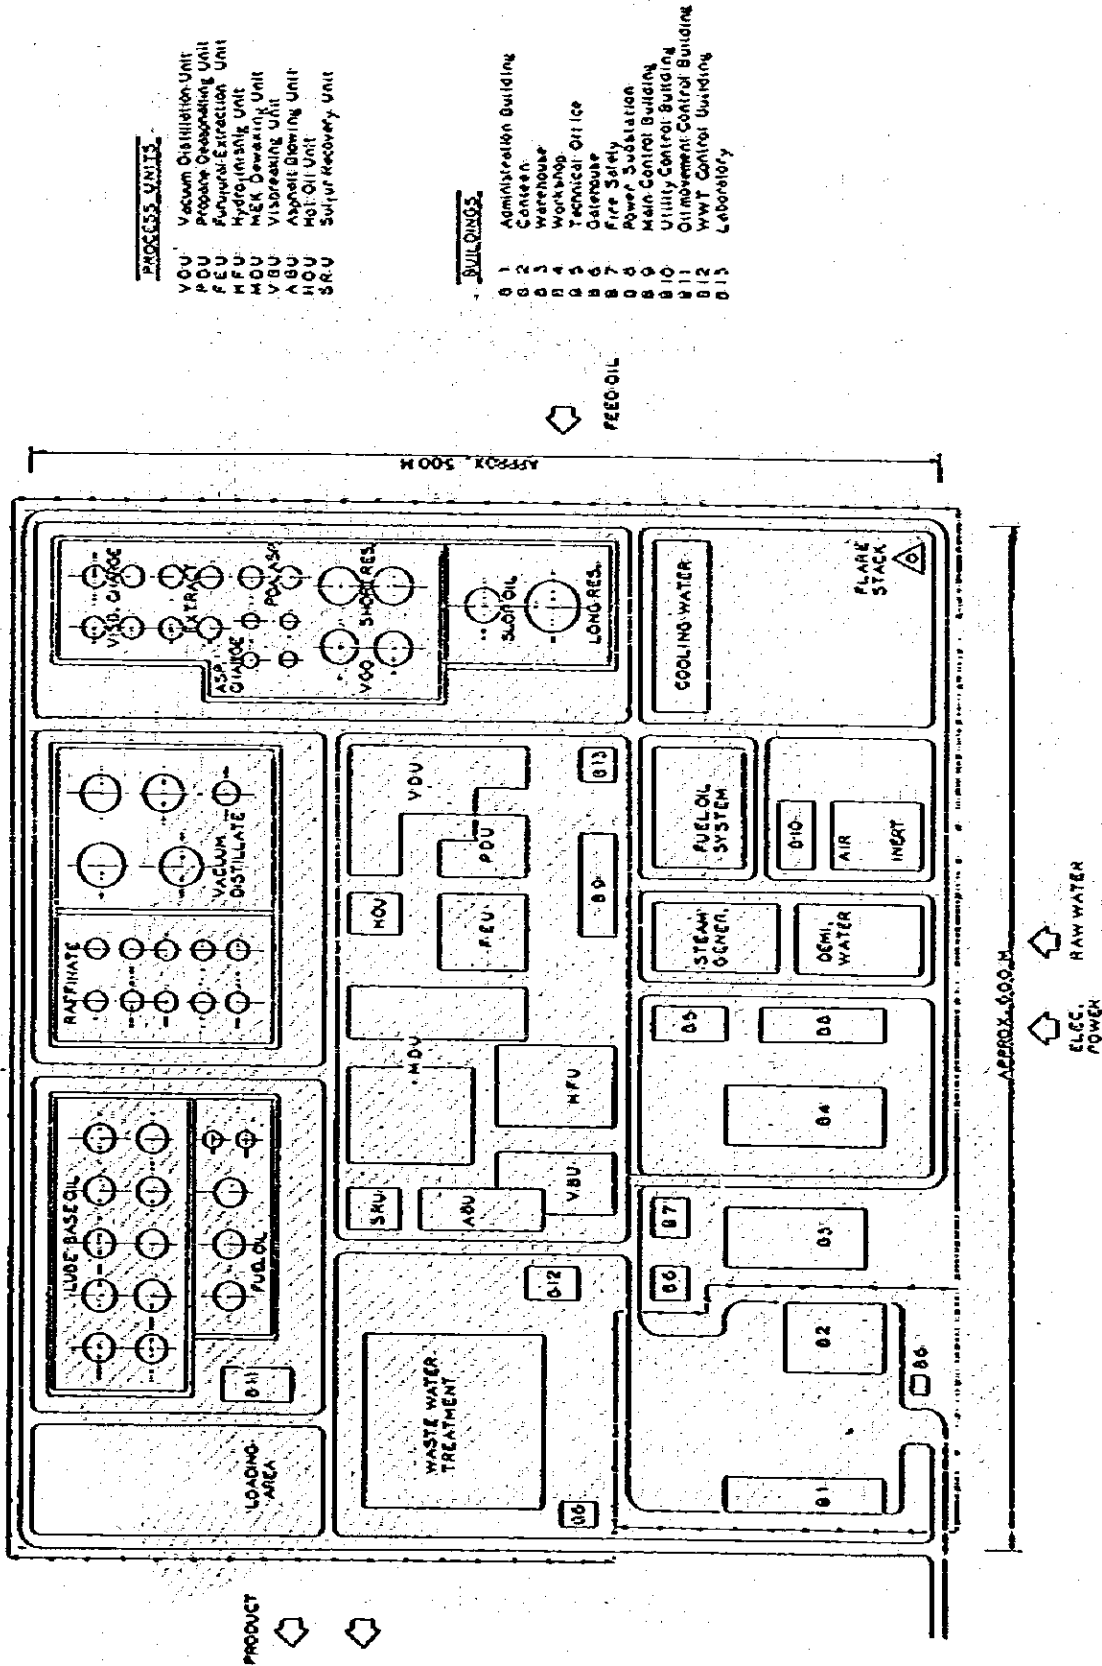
PLOT PLAN FOR LUBE OIL PLANT
